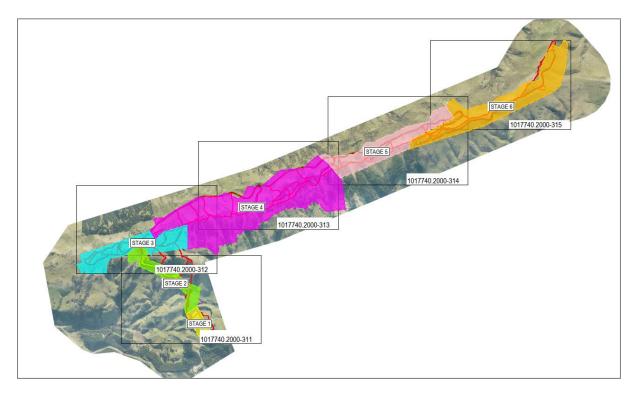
Mt Cass Construction Zone Boundary Plan (refer Appendix A sheet 1 for more detail)
